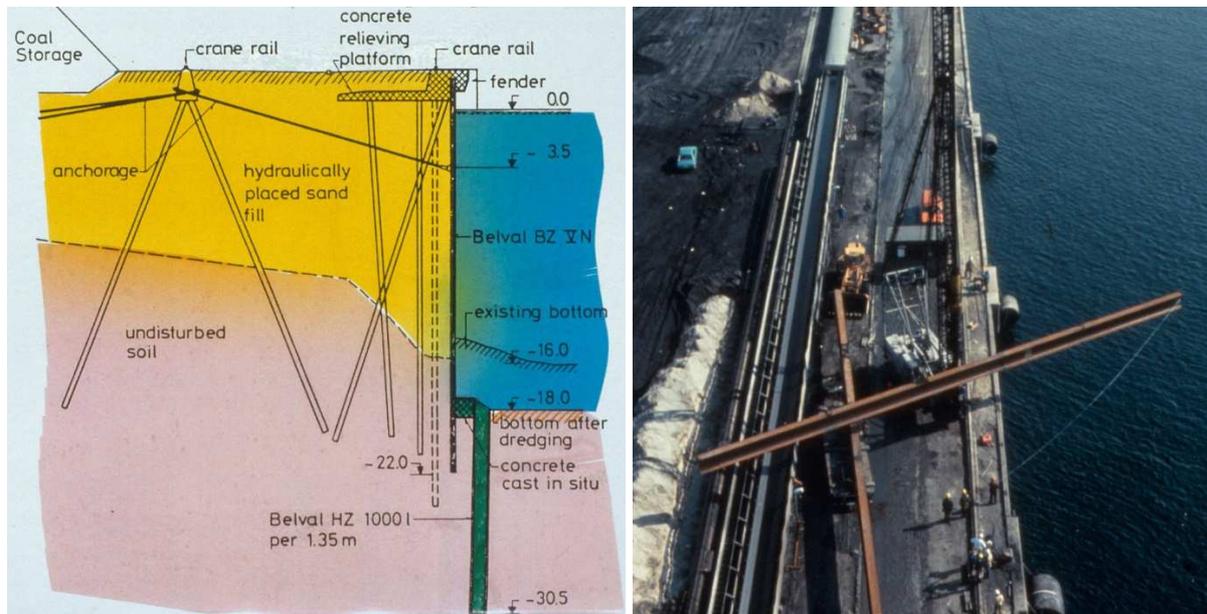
(a) Cross section of quay wall; (b) Driving of H-steel piles
